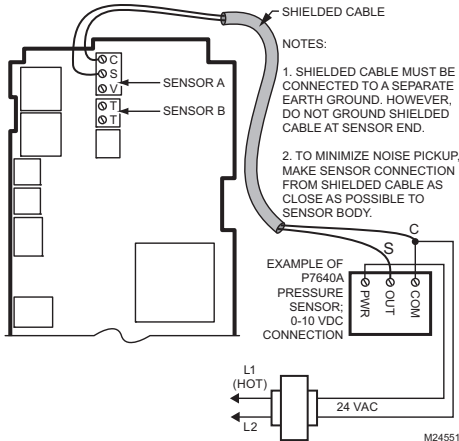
Sensor Wiring — 2-wire shielded cable connection from Sensor A to a 0-10 Vdc sensor using separate transformer.
